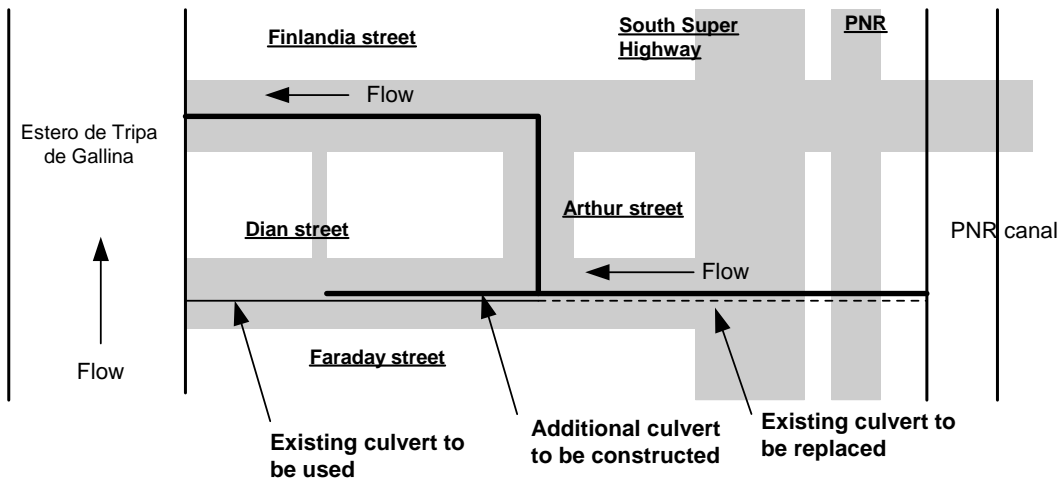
Proposed Route of Additional Culvert in Faraday Drainage Main
